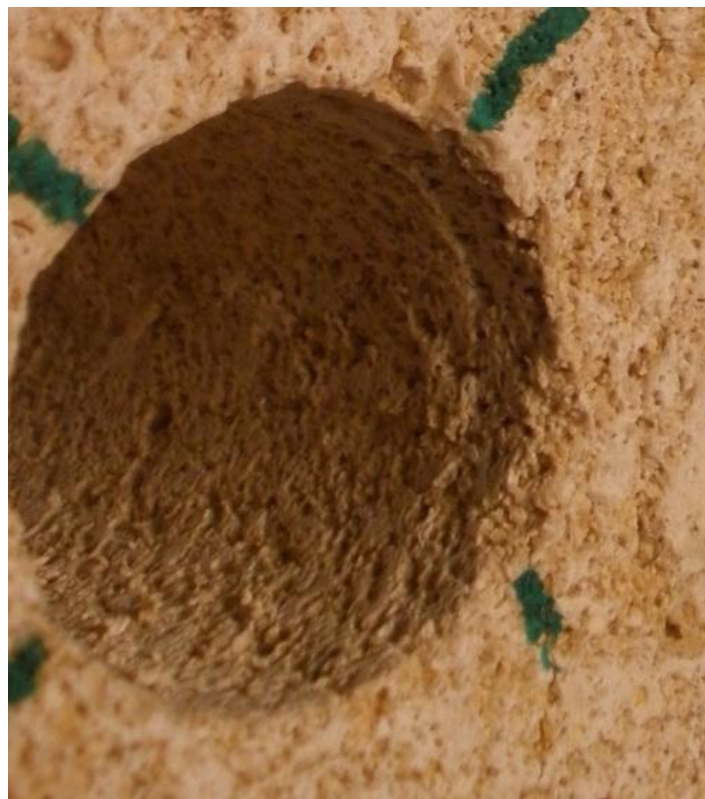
Cracks in specimen 12 for point 2 of the figure 5.11. Rupture on the right wall of the drillhole. Picture was taken from side A of the specimen.
